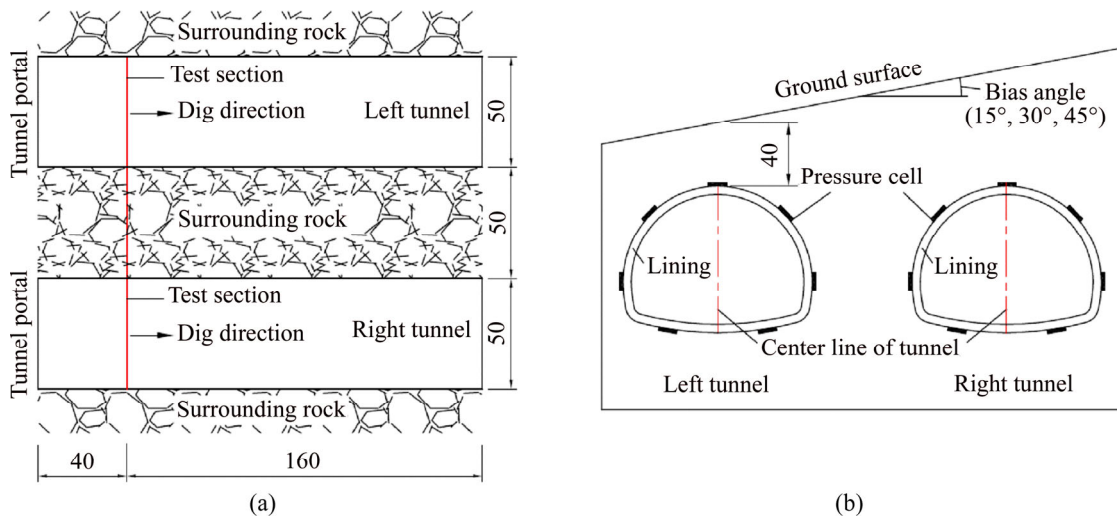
Locations of test section and measuring points (Unit: cm): (a) Test section; (b) Measuring points
